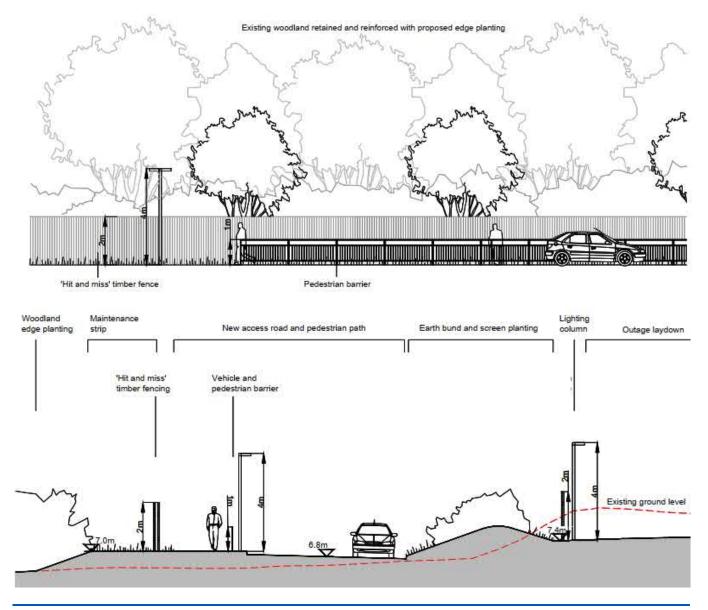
Elevation and Section of Proposed Coronation Wood Design in Vicinity of the Western Access Road
